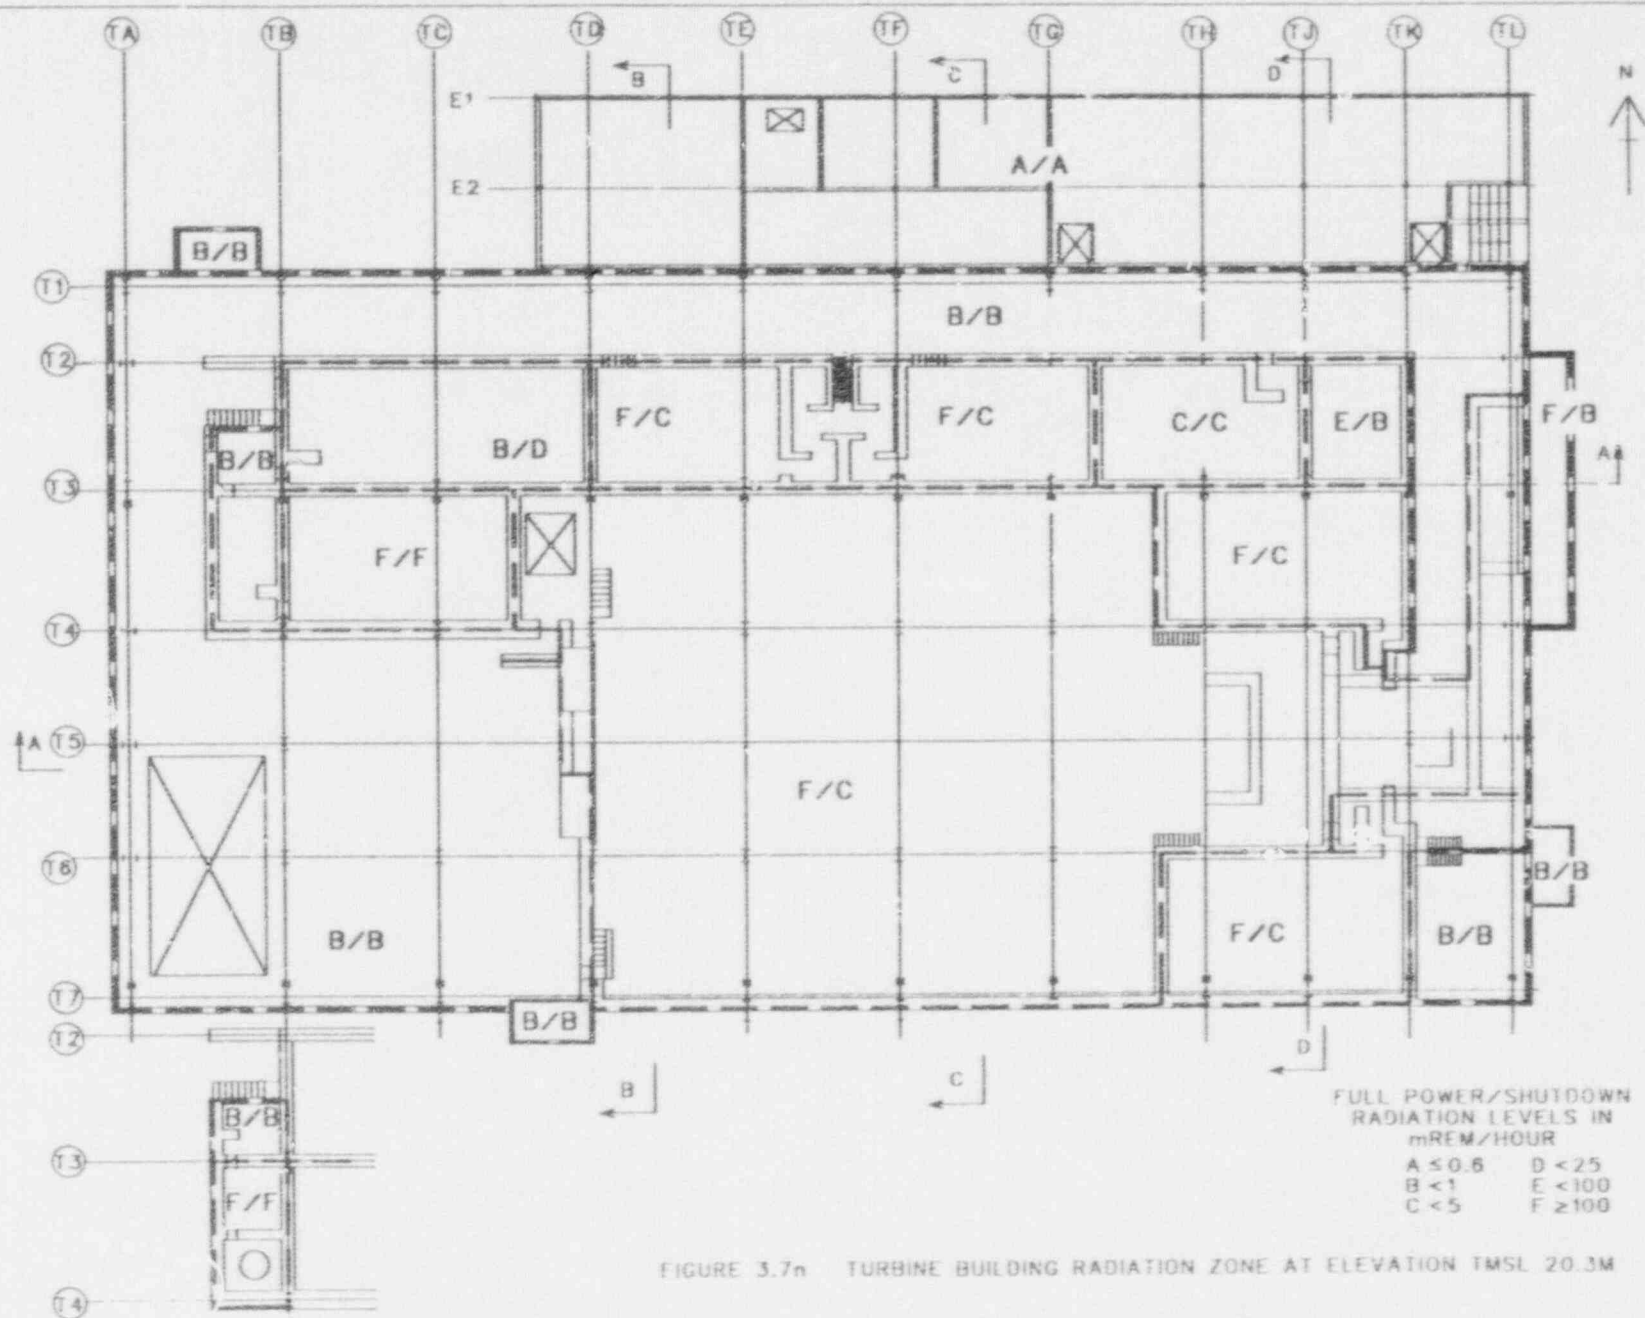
TURBINE BUILDING RADIATION ZONE AT ELEVATION TMSL 20.3M
